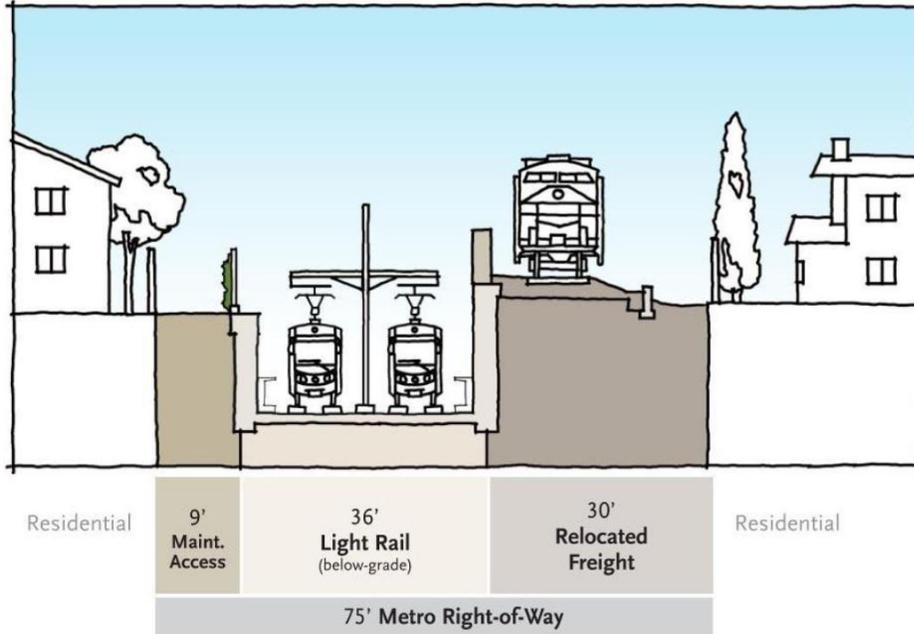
Locally Preferred Alternative – Looking South between 165th Street and 168th Street
